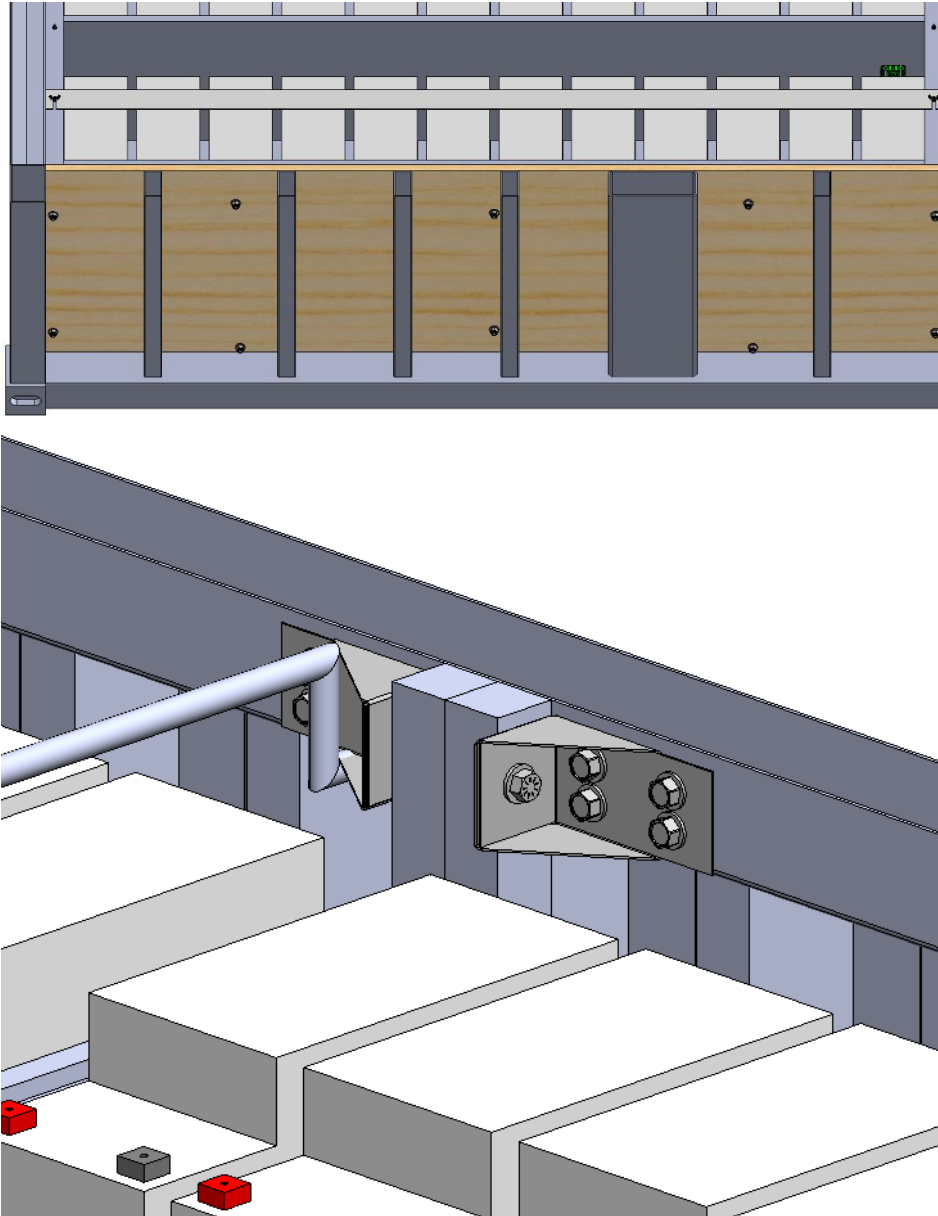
Rack installation to floor (top) and ceiling beam with bracket (bottom).
